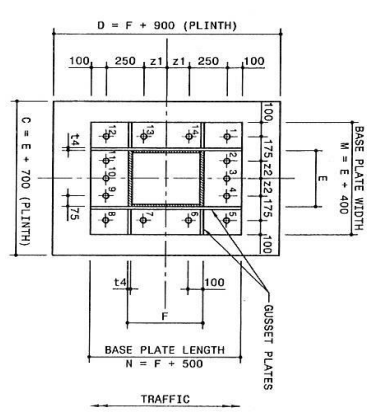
PLAN OF PLINTH, BASE PLATE AND HD BOLTS
